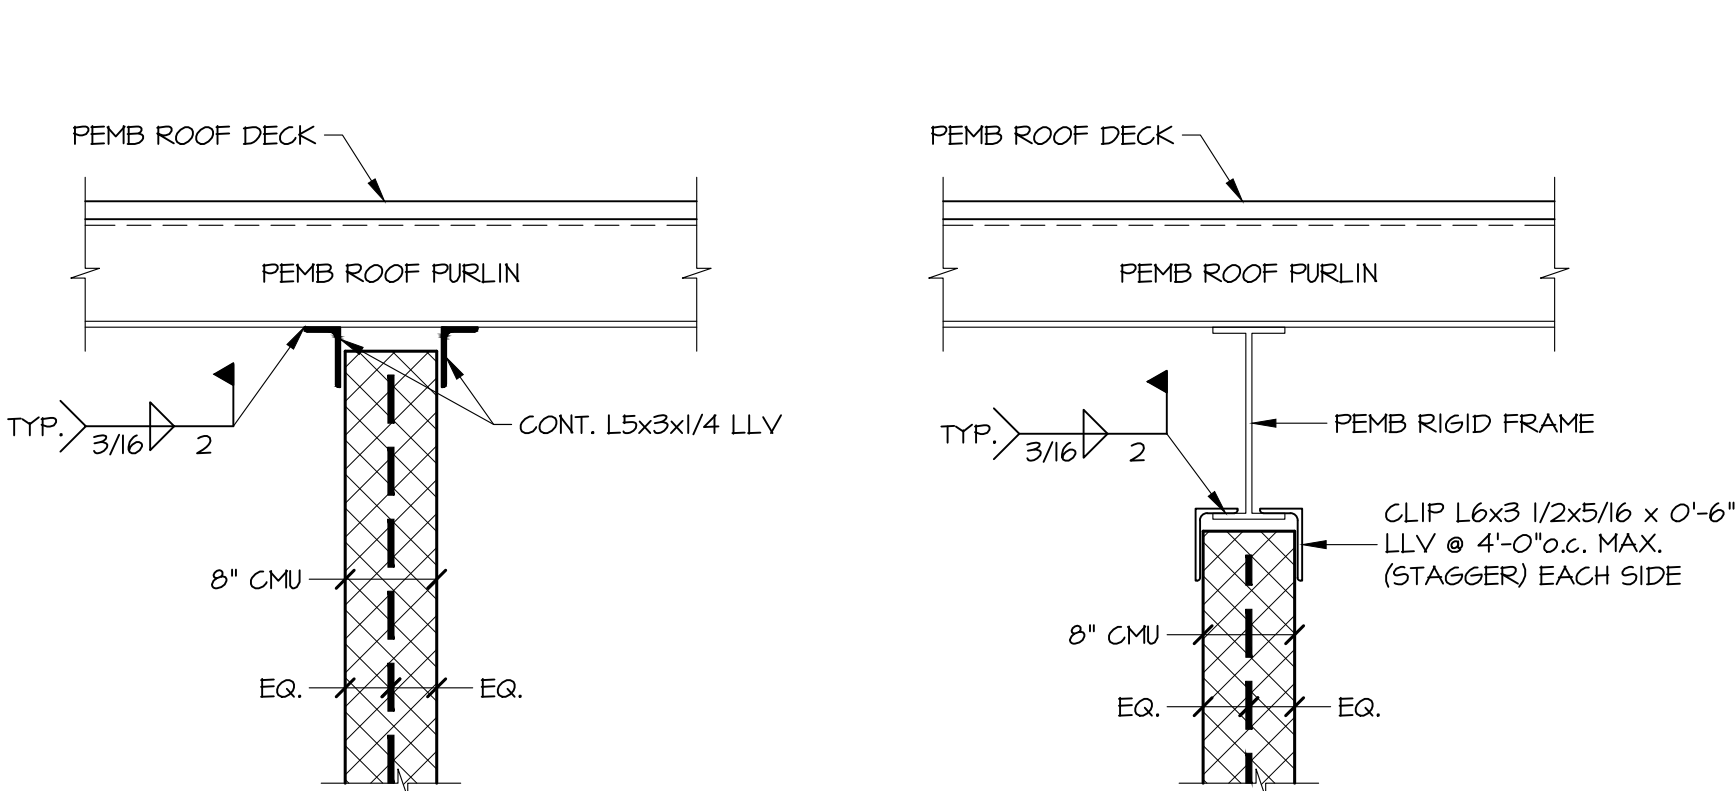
DETAIL E N.T.S. TYPICAL REINFORCED MASONRY CONSTRUCTION
